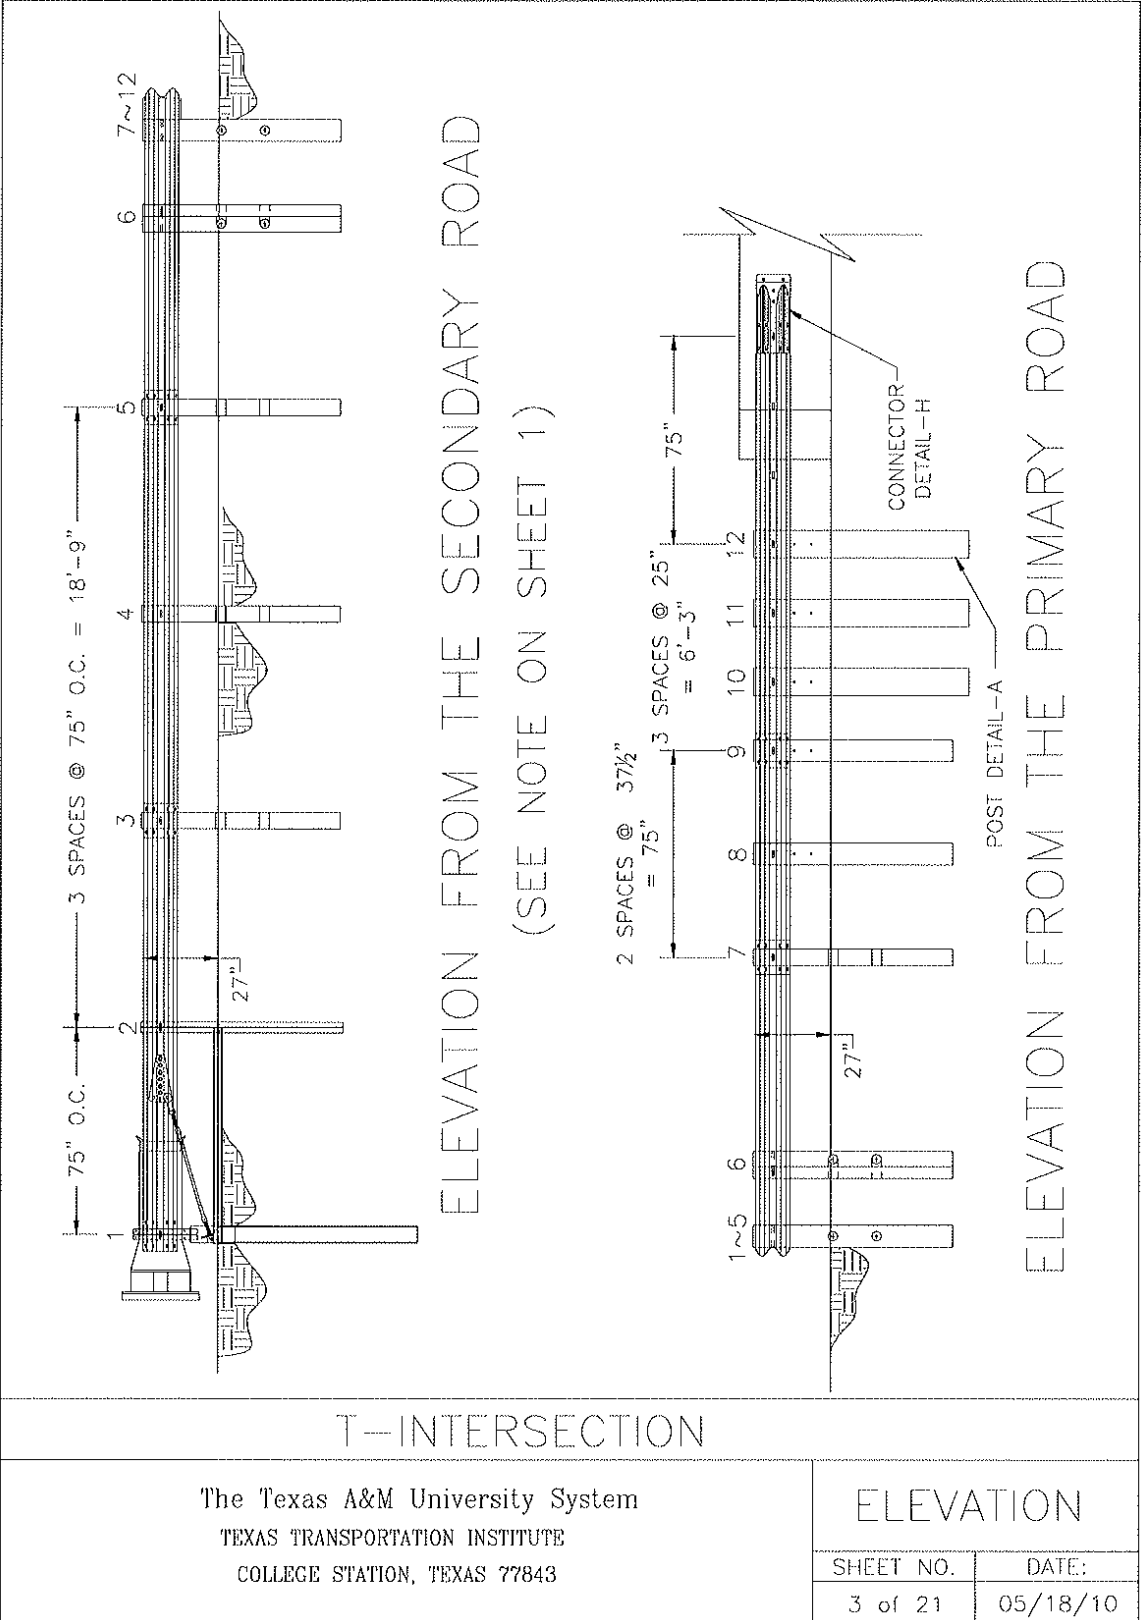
Rail Elevation, Post Spacing, and Post Details [27]
